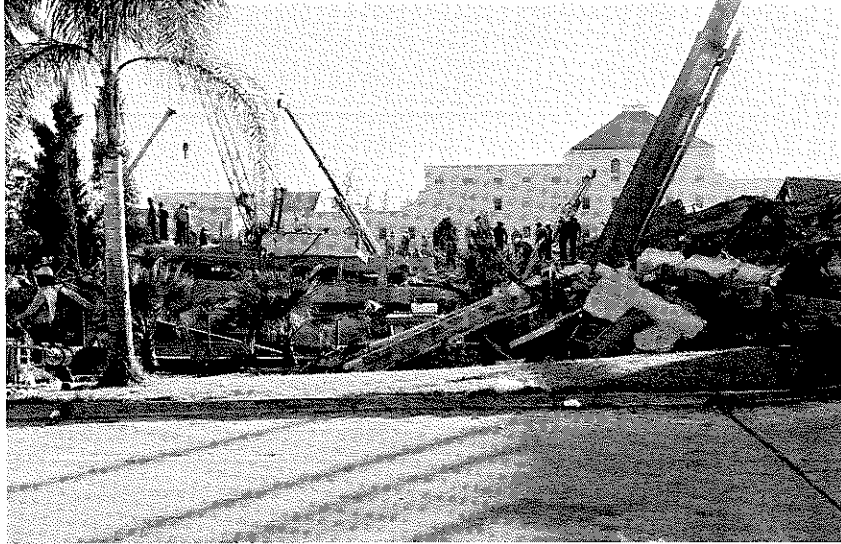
Collapsed building at the Veterans Administration Hospital. Building in background was not damaged significantly.
